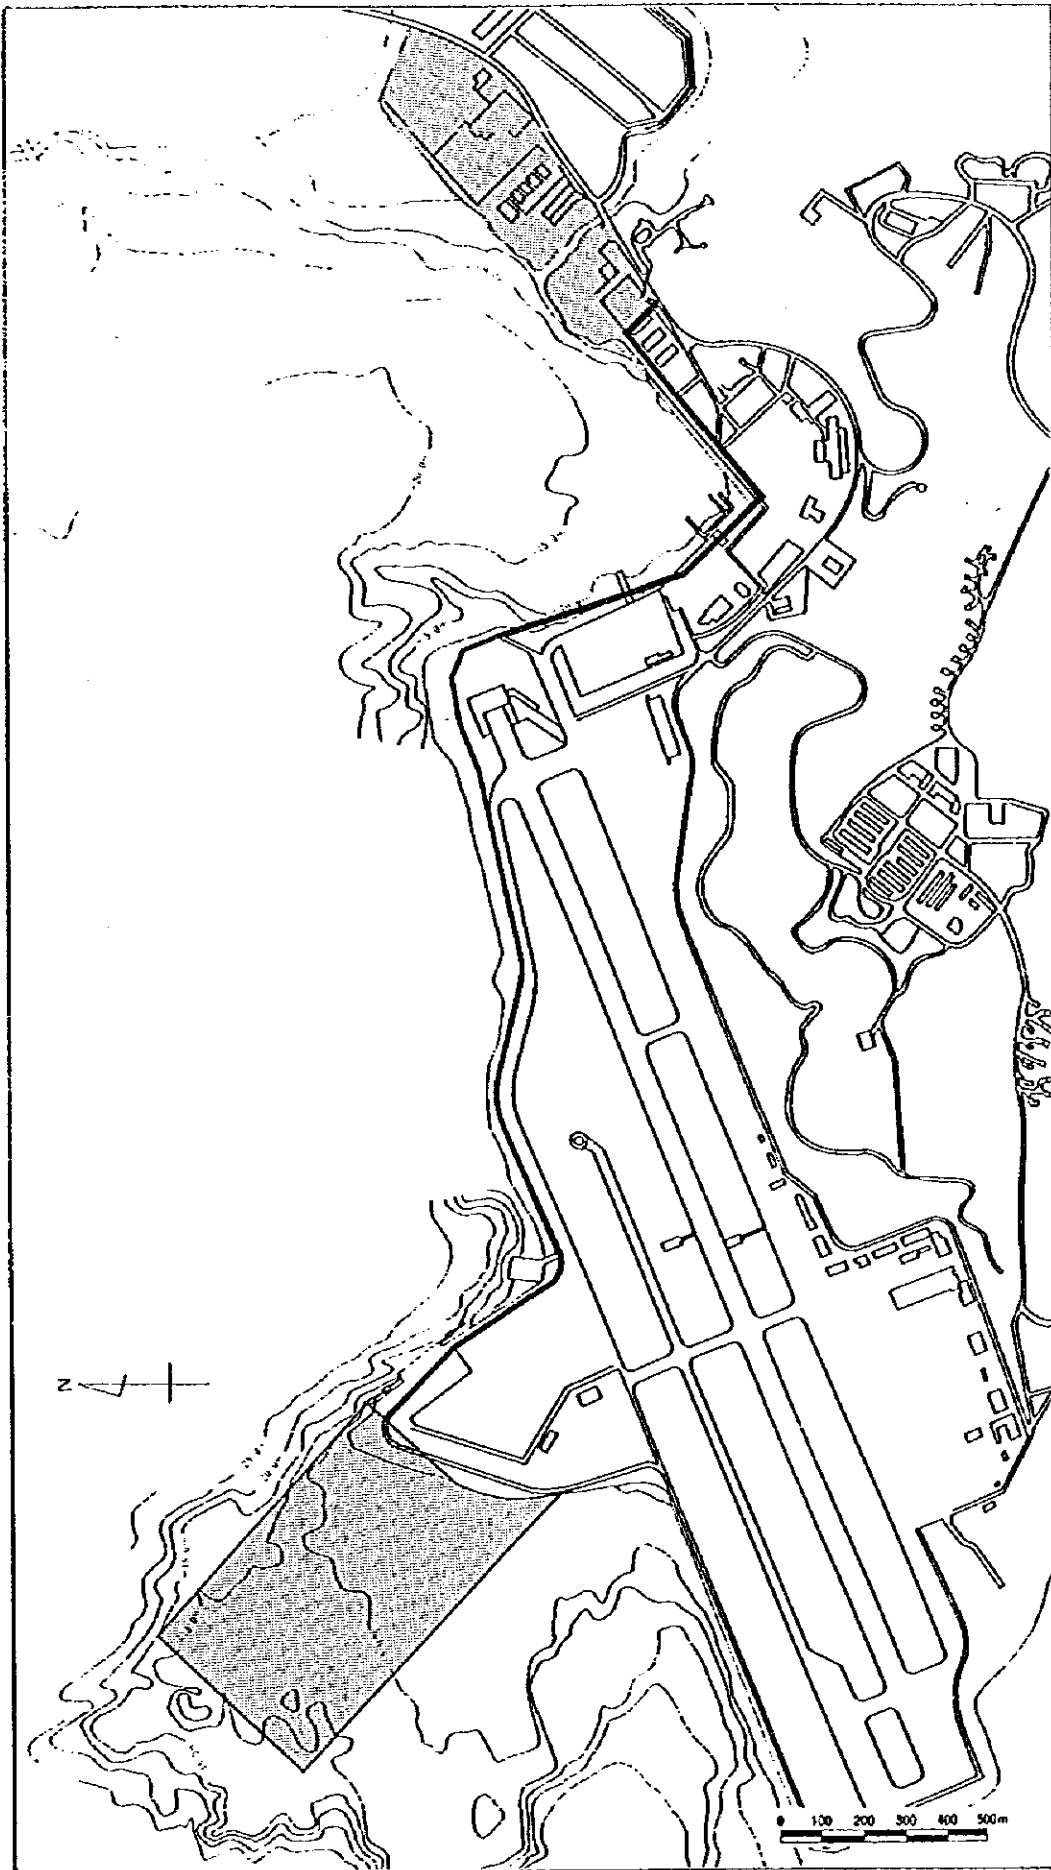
Route Plan of Access Road in Alternative-3
